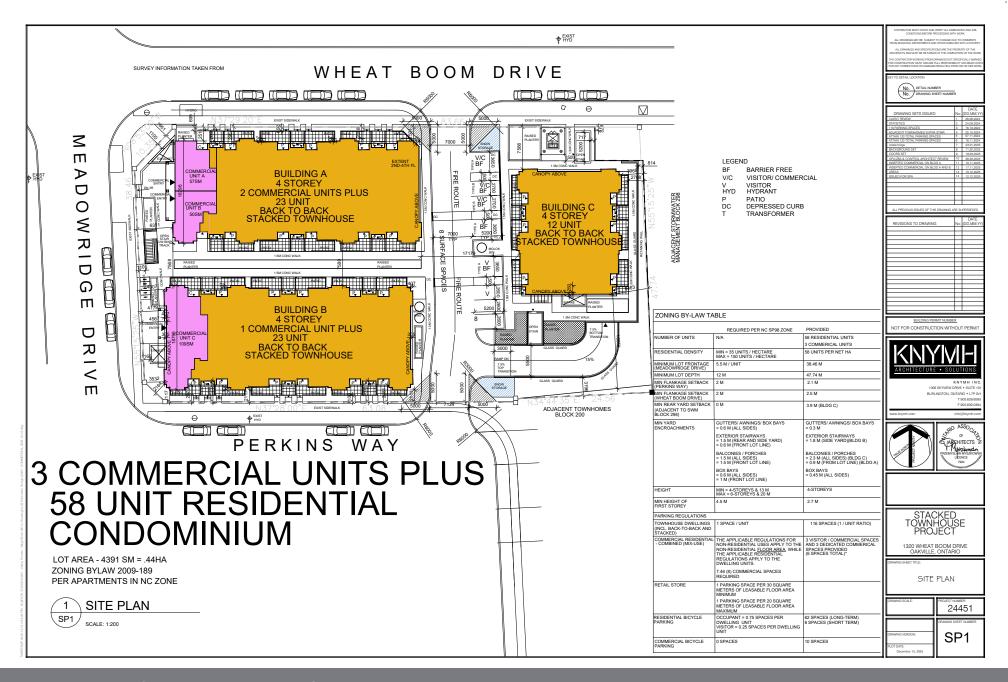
Joshua Creek 1320 Wheat Boom Drive Site Plan
